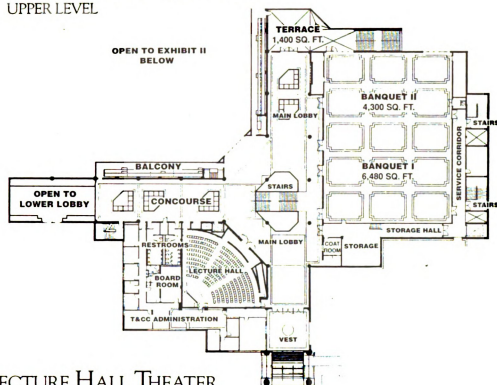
Floor plan of the North West Georgia Trade and Convention Center.
